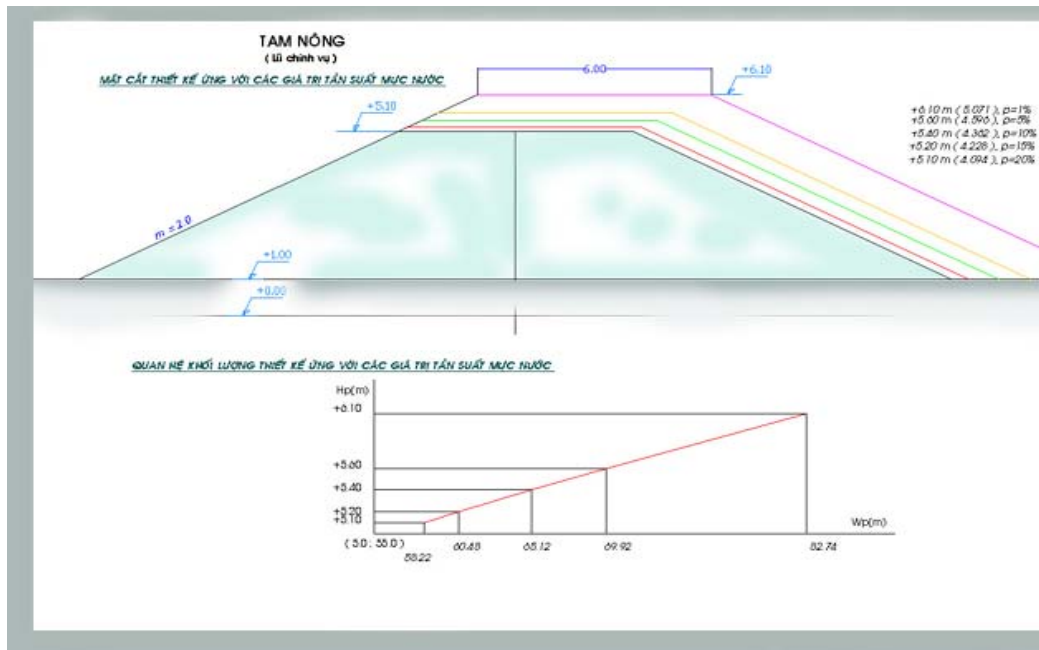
Typical cross-section of embankment for Tam Nong Town
